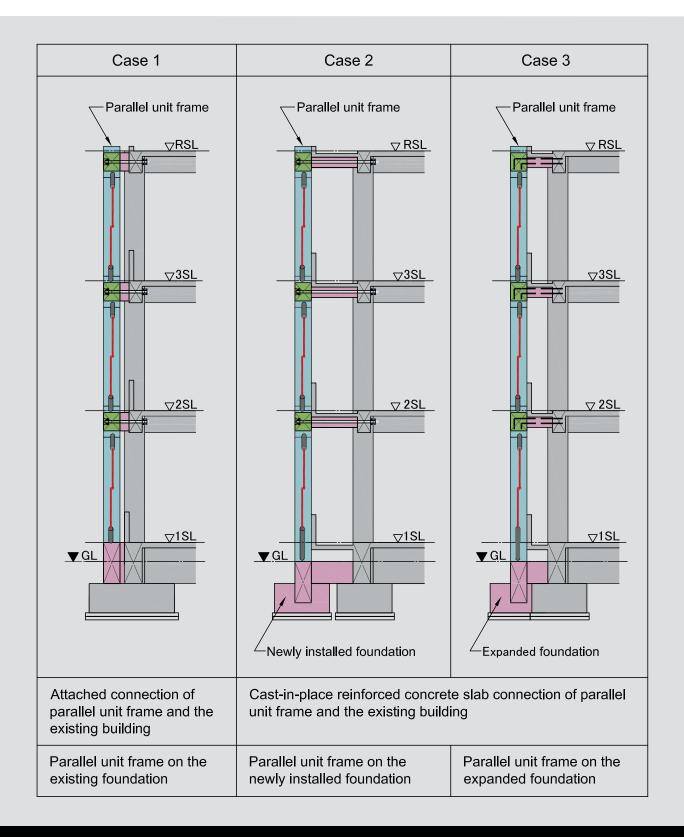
Three ways to connect parallel unit frame and building. Case 1 can be used for a building without overhang. Case 2 can be used for a building with large overhang. Case 3 can be used for a building with a small overhang.
